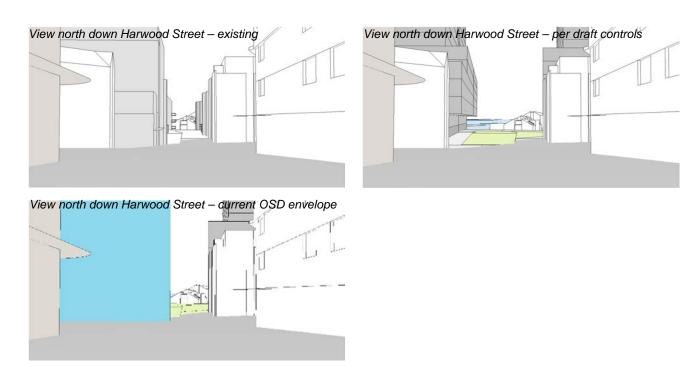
looking north along Harwood Street, from the intersection of Pyrmont Bridge Road
